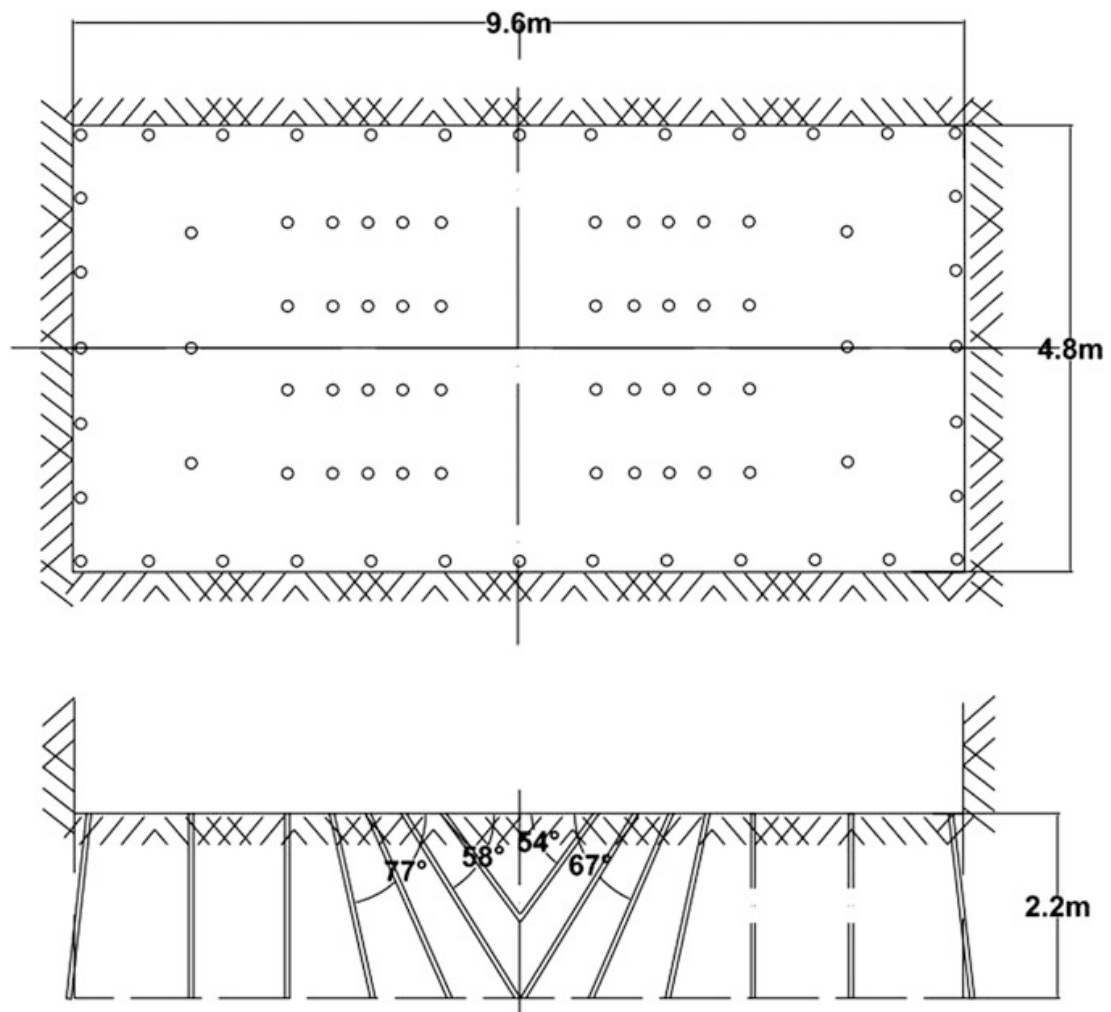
Drilling pattern in a rectangular-section shaft
